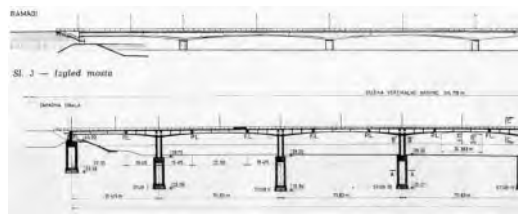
The Bridge over the Euphrates in Fallujah. Detail of the façade and longitudinal section. Source: Trojanović, p.132.
